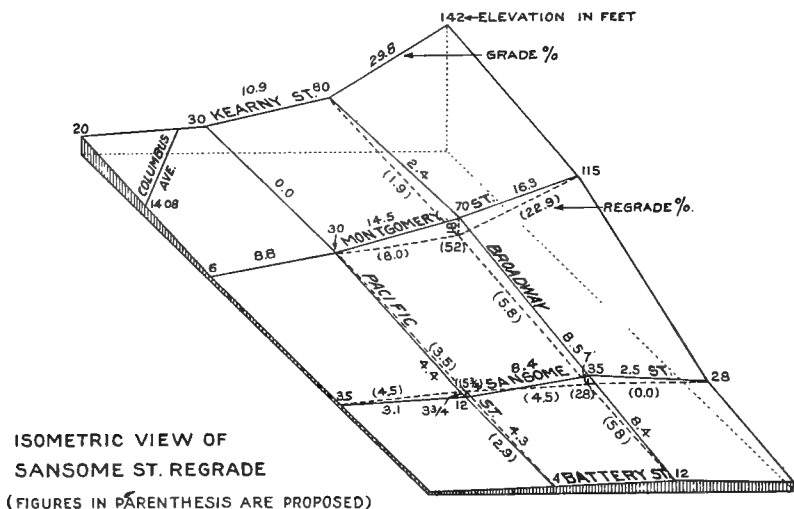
ISOMETRIC VIEW OF SANSOME STREET REGRADE.
